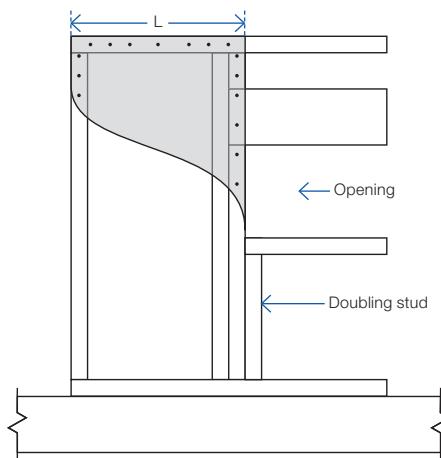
GS BRACING ELEMENTS (OPTION A)
